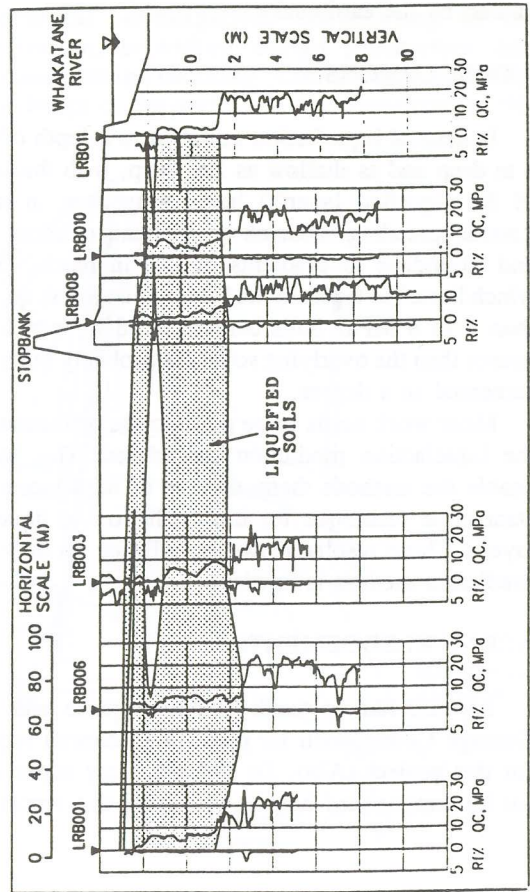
Section AA at Landing Road Bridge site showing CPT data and estimated liquefied soils.
